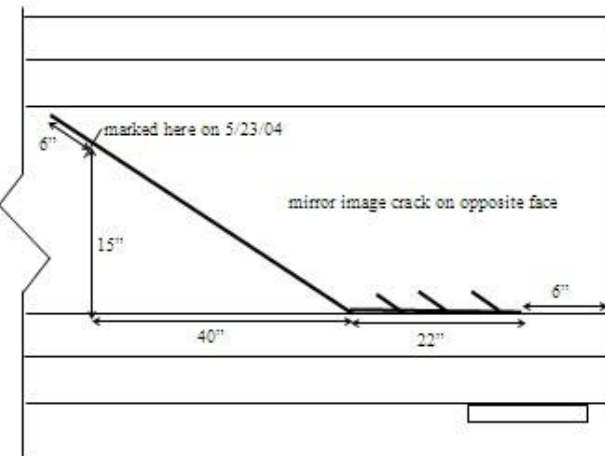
Crack Diagram For Girder 5th From West Side, West Face, South Abutment (Bridge 18, #12693).
